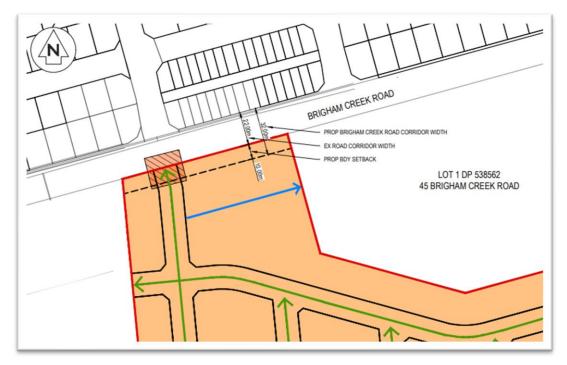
Plan from PC86 documentation showing pedestrian connection (blue arrow)
